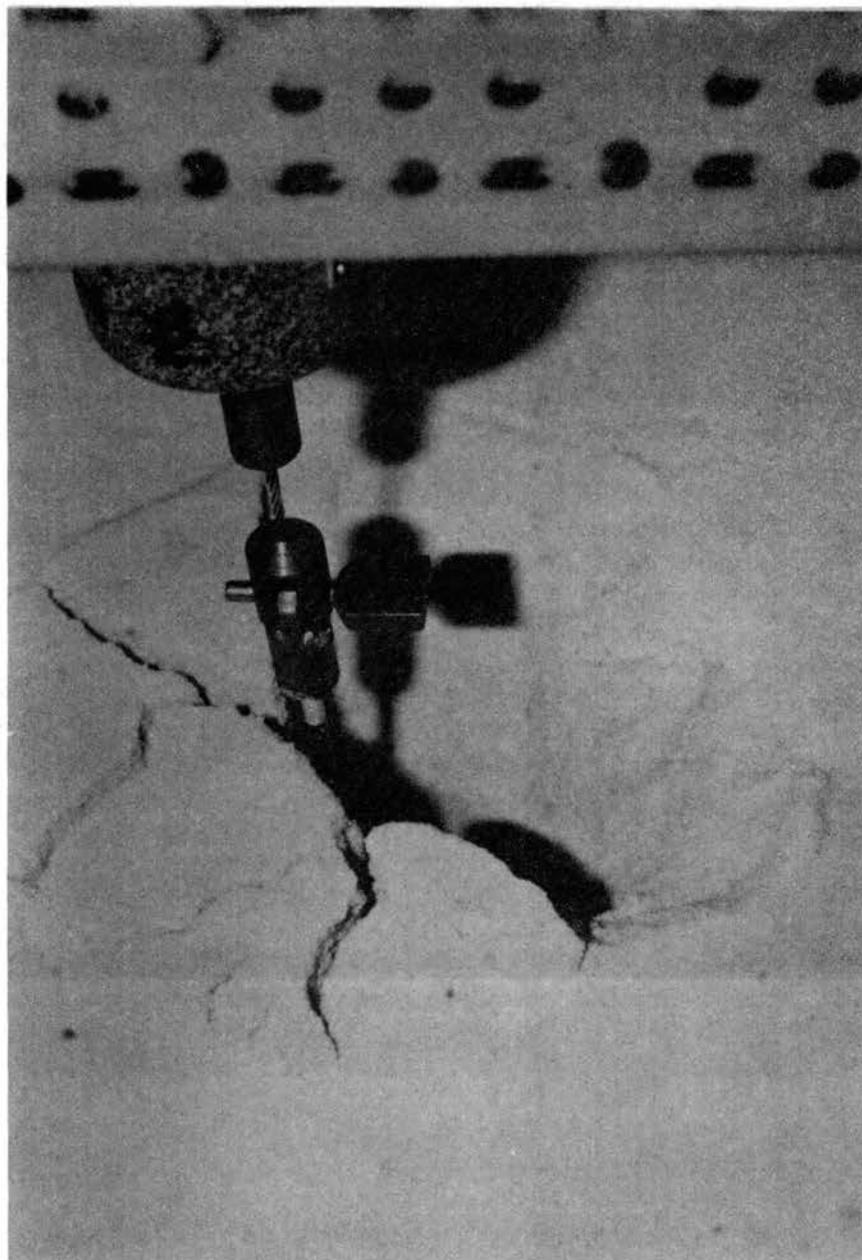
Sectional View Through the Breaking-Out Mass of Soil
